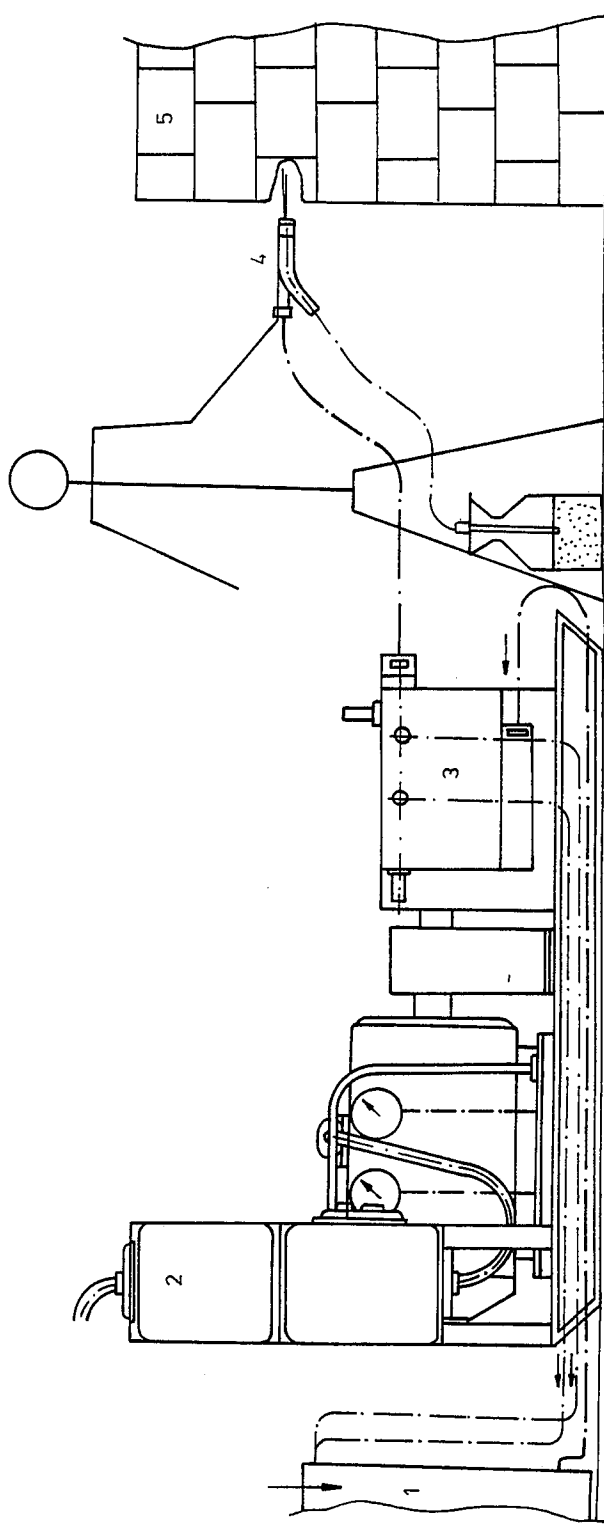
HYDRAULIC SCHEME OF THE WATER - SAND JET CUTTING FOR THE BRICK WALL.
